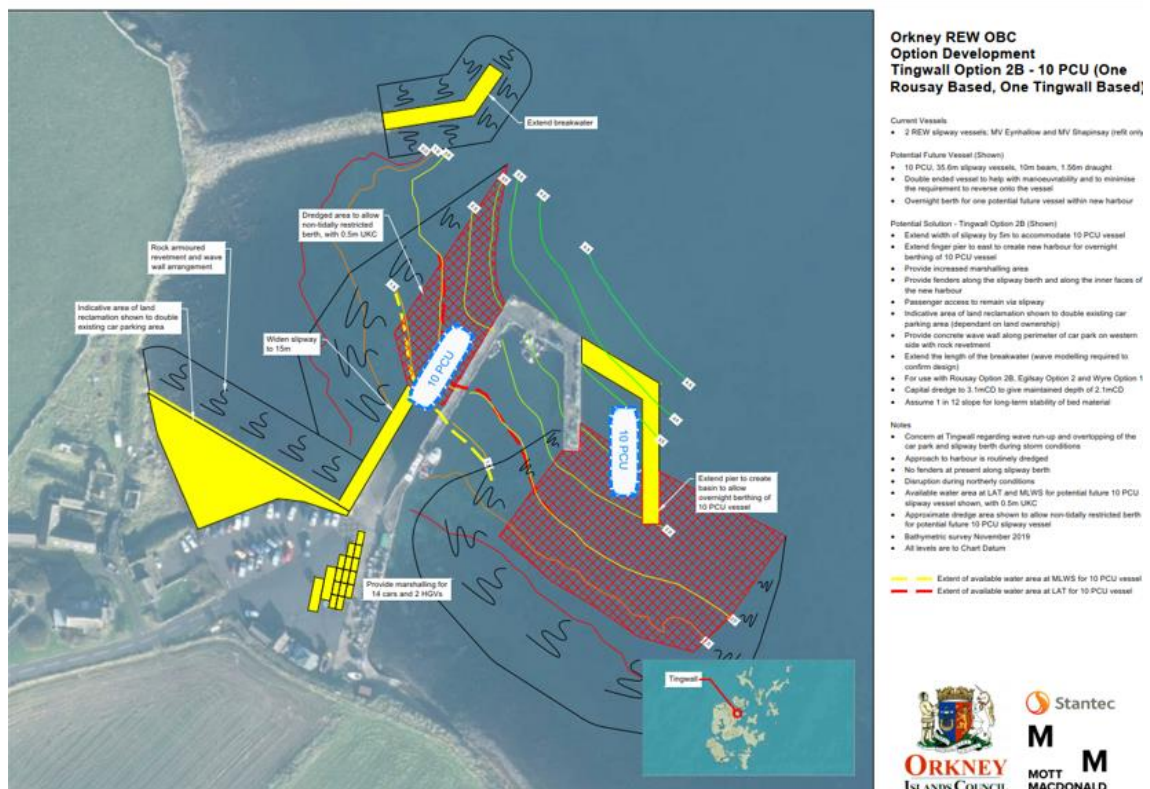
Option 2 – Tingwall general arrangement, with one overnight berth
